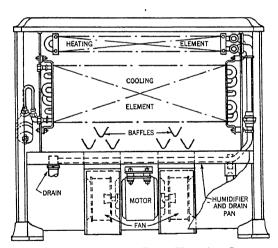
Remote Floor Type Room Unit Air Conditioner
